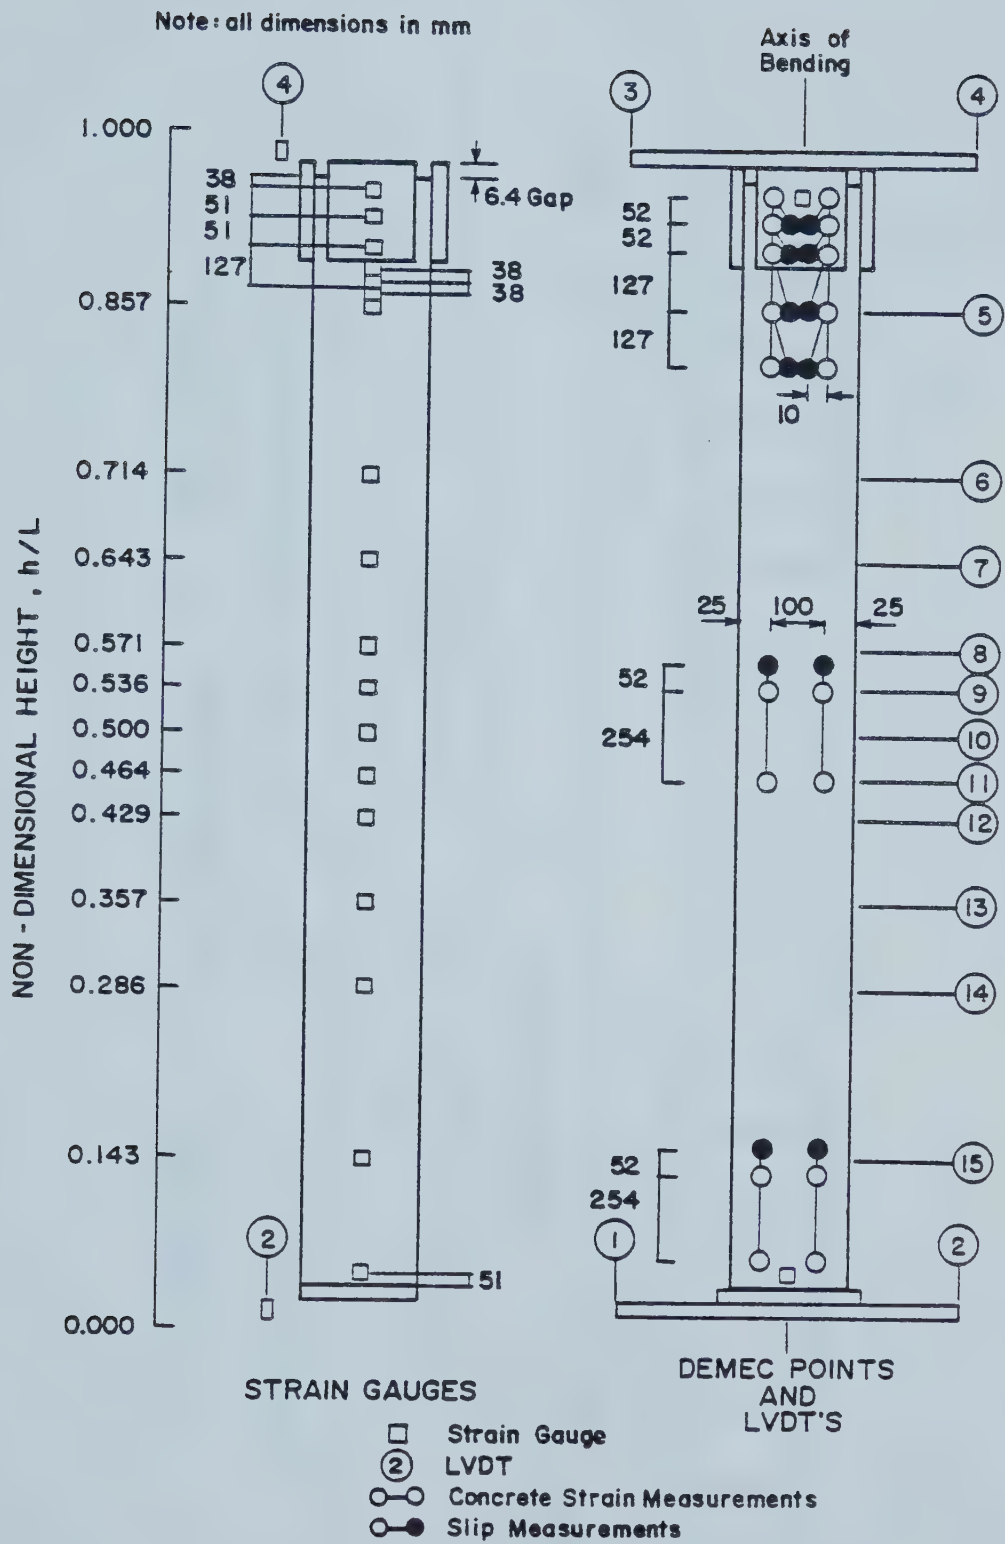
Schematic Diagram of Instrumentation on a Column Specimen
